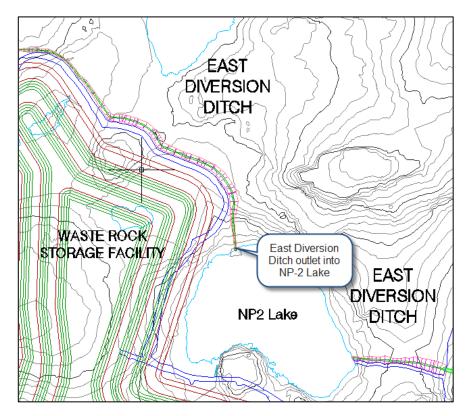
View of the East Diversion ditch outlet into NP-2 Lake
